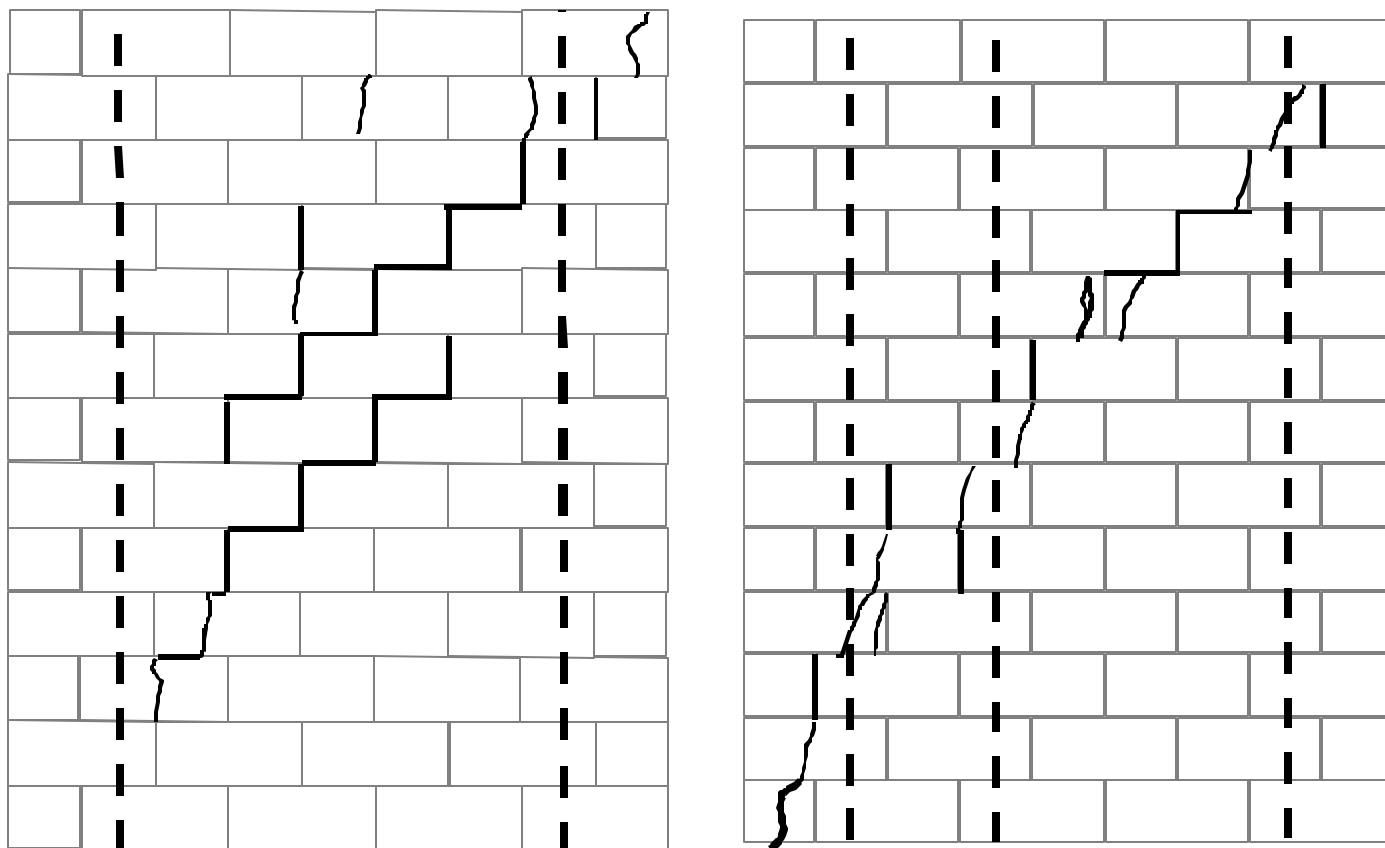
Cracking and Slippage Locations for 72 inch Wide Wall Assemblies
